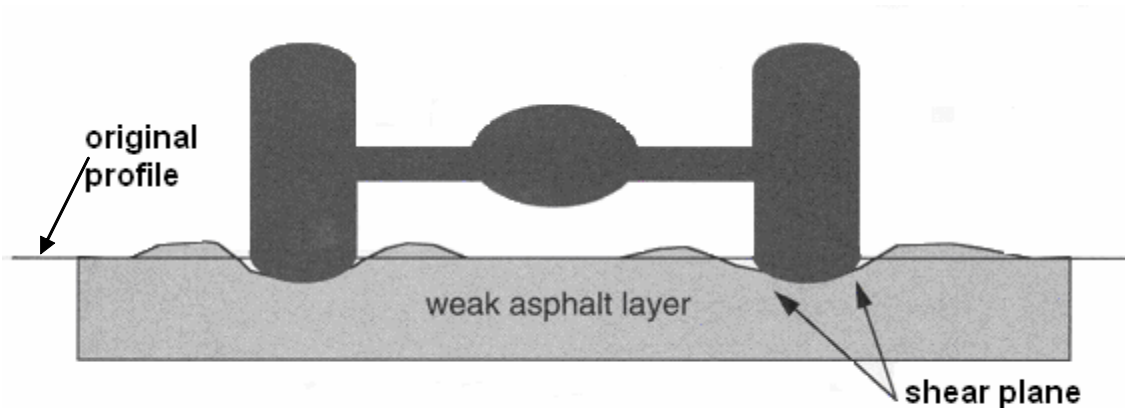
Rutting of Weak Asphalt Pavement Layer (after Asphalt Institute 1996)
